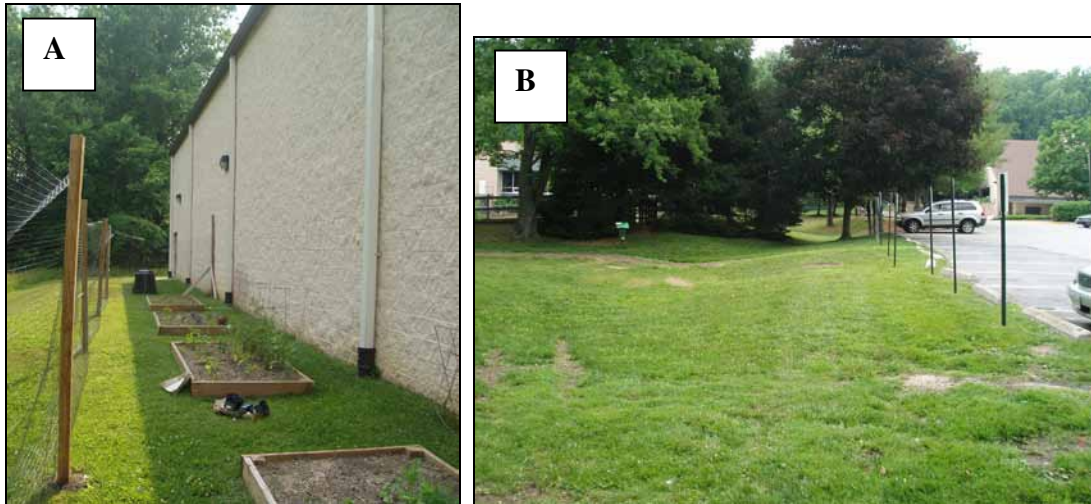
Restoration Opportunities at The Park School A. Downspout Disconnection B. Stormwater Retrofit to Treat Parking Lot Runoff.
